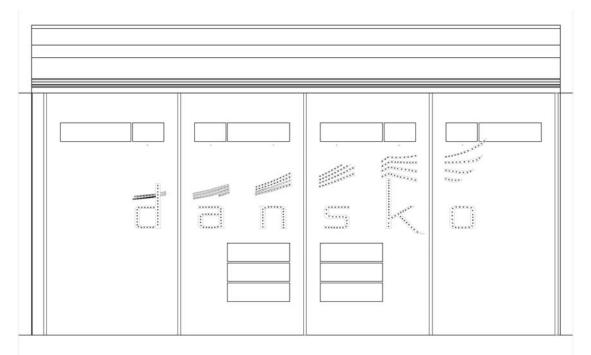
Façade Luminaire Layout – Version 1 Elevation
